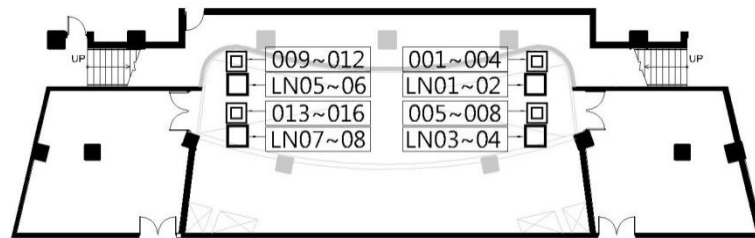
Orchestra Pit Lighting Circuit Layout
